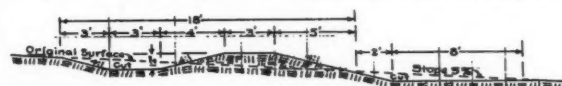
A ground slope and terrace shaped the same as in Fig. 1, except that dirt is moved from both sides to build the embankment and 18½ cubic yards of excavation are required per 100 lineal feet of terrace
